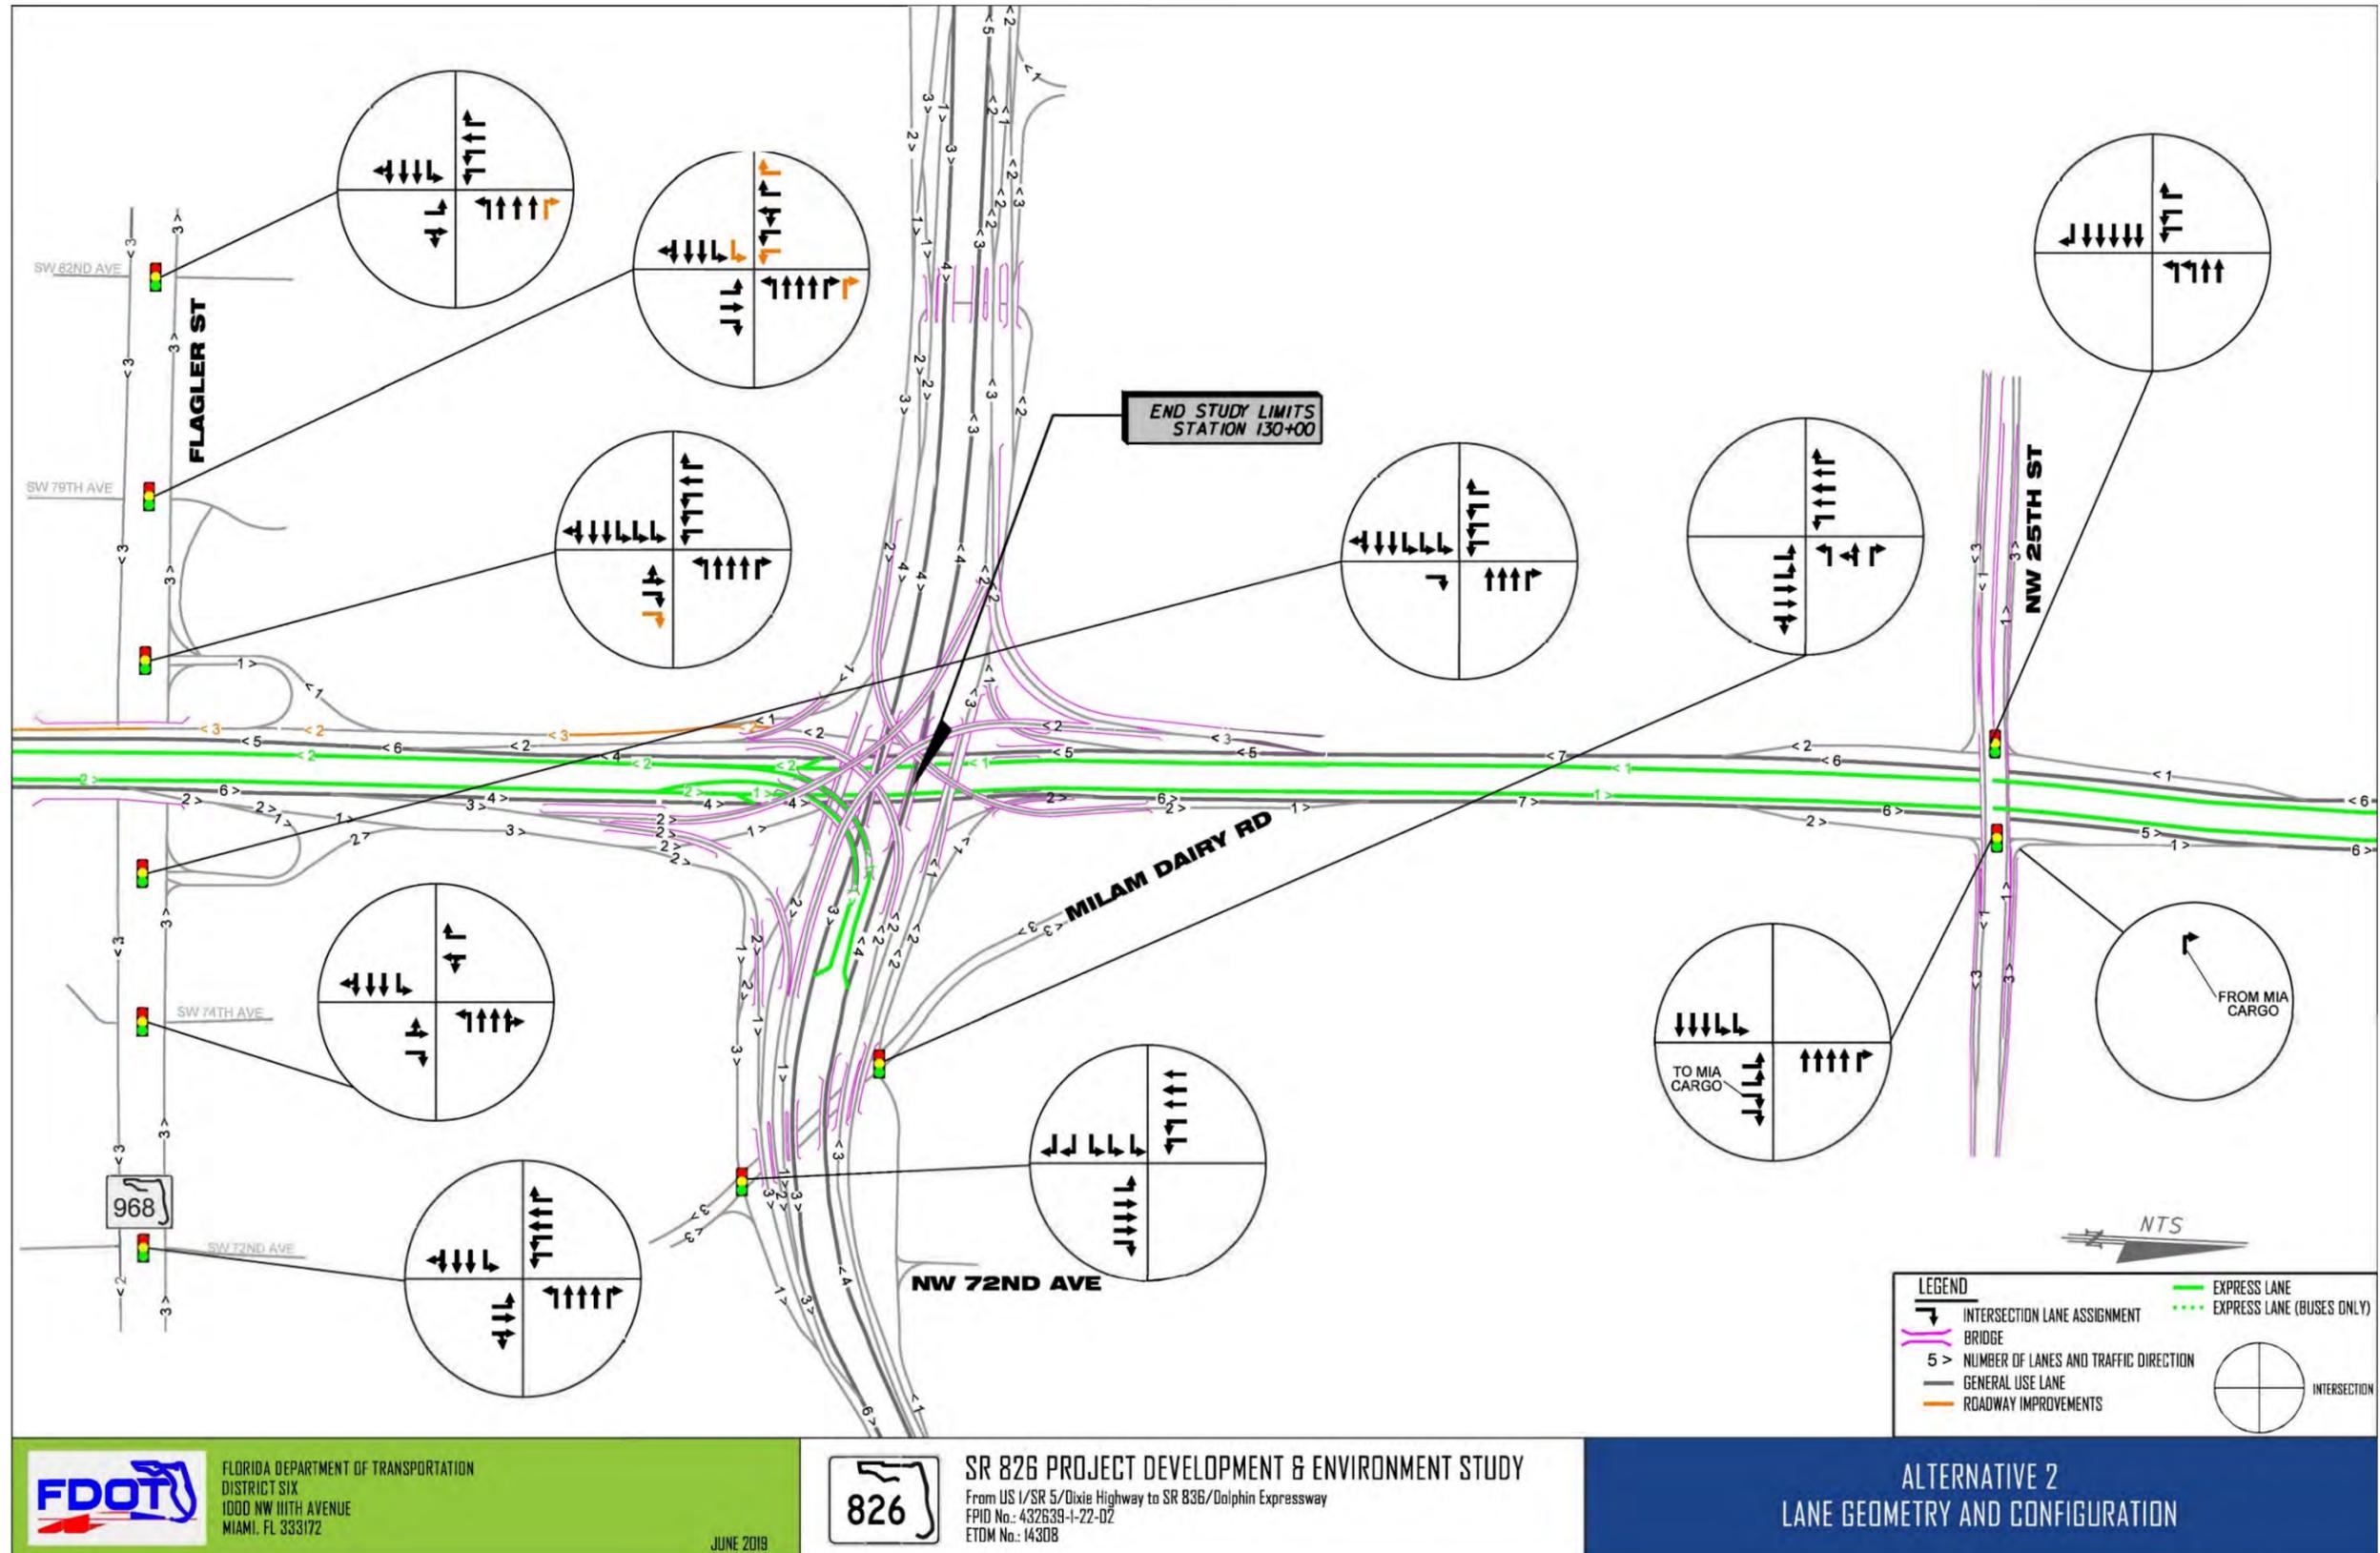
Preferred Alternative Lane Geometry and Configuration from South of Flagler Street to NW 25th Street
